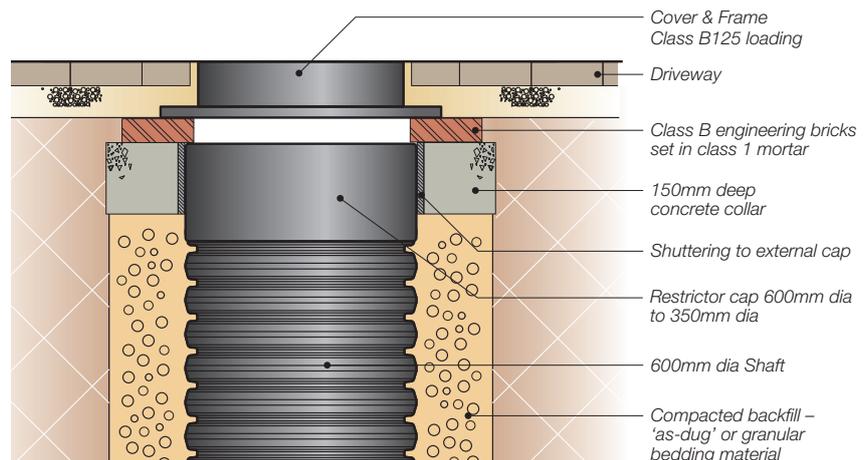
Installation detail for B125 loading: paved areas with limited traffic load
